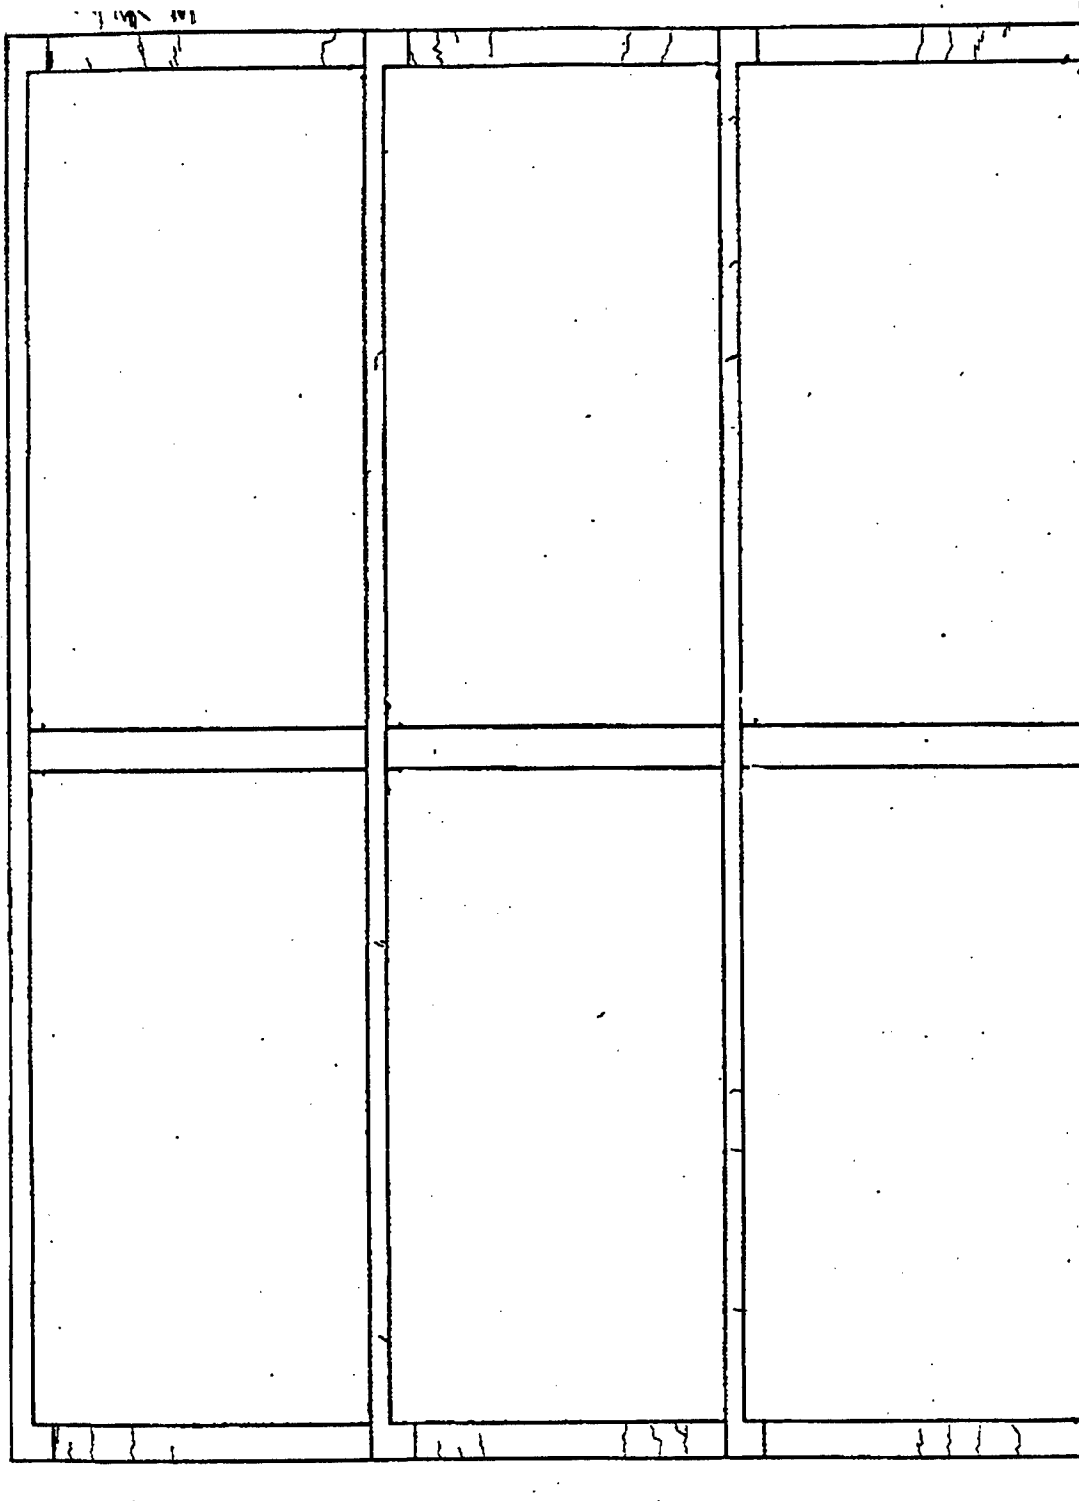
Crack Pattern, East Side of East Columns, Post-T420DL
